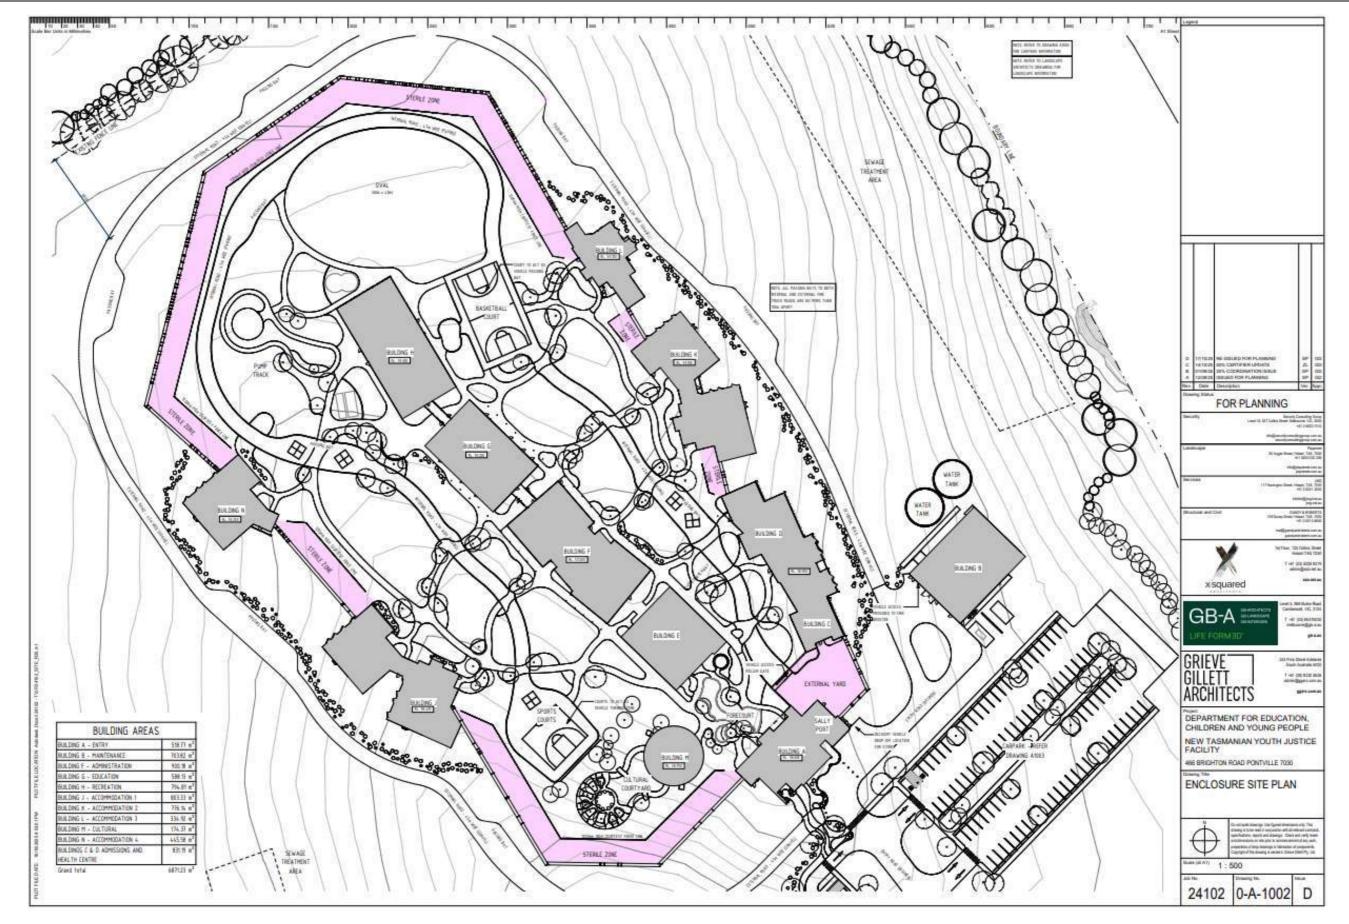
Detailed design for the Proposed Tasmanian Youth Justice Facility at 466 Brighton Road, Pontville.
